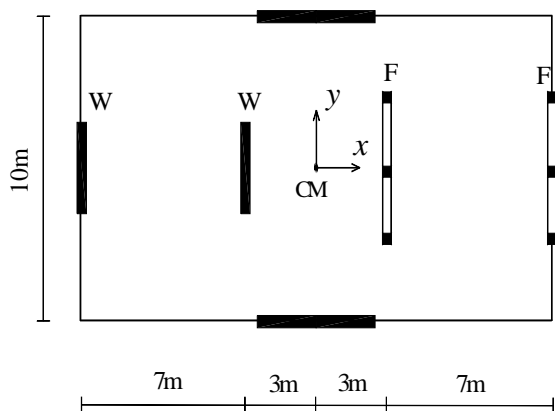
Floor plan of the building, comprising wall (W) and frame (F) resisting elements.
